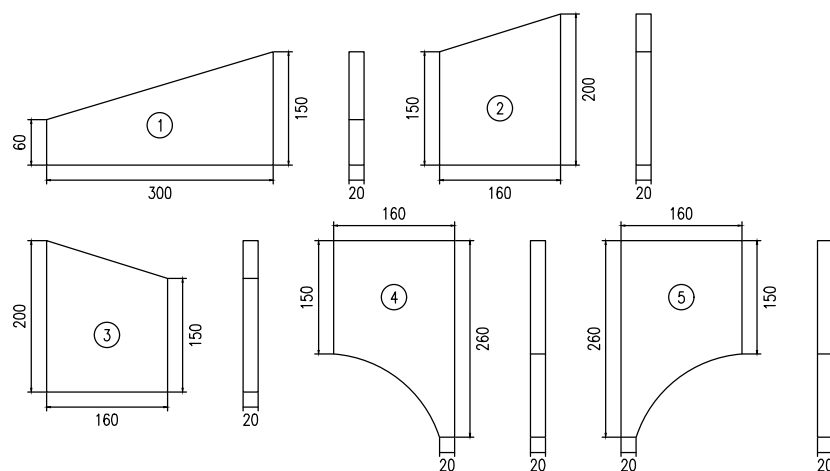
DETAILED DRAWING OF THE CONNECTION BETWEEN COLUMNS AND BEAMS
